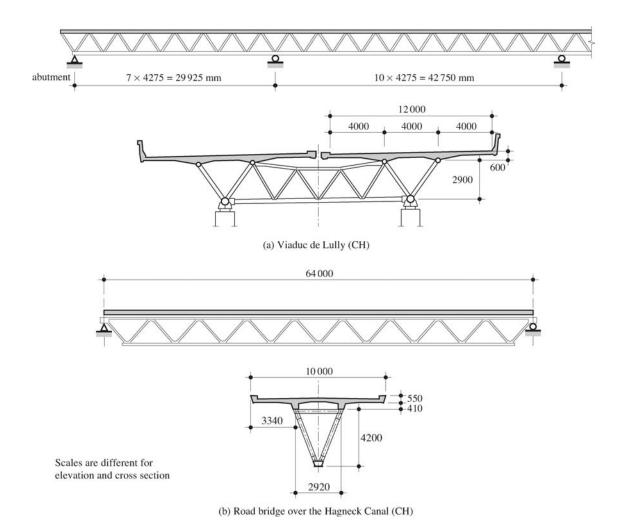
Recent examples of truss bridges (Engineer DIC, Aigle).
